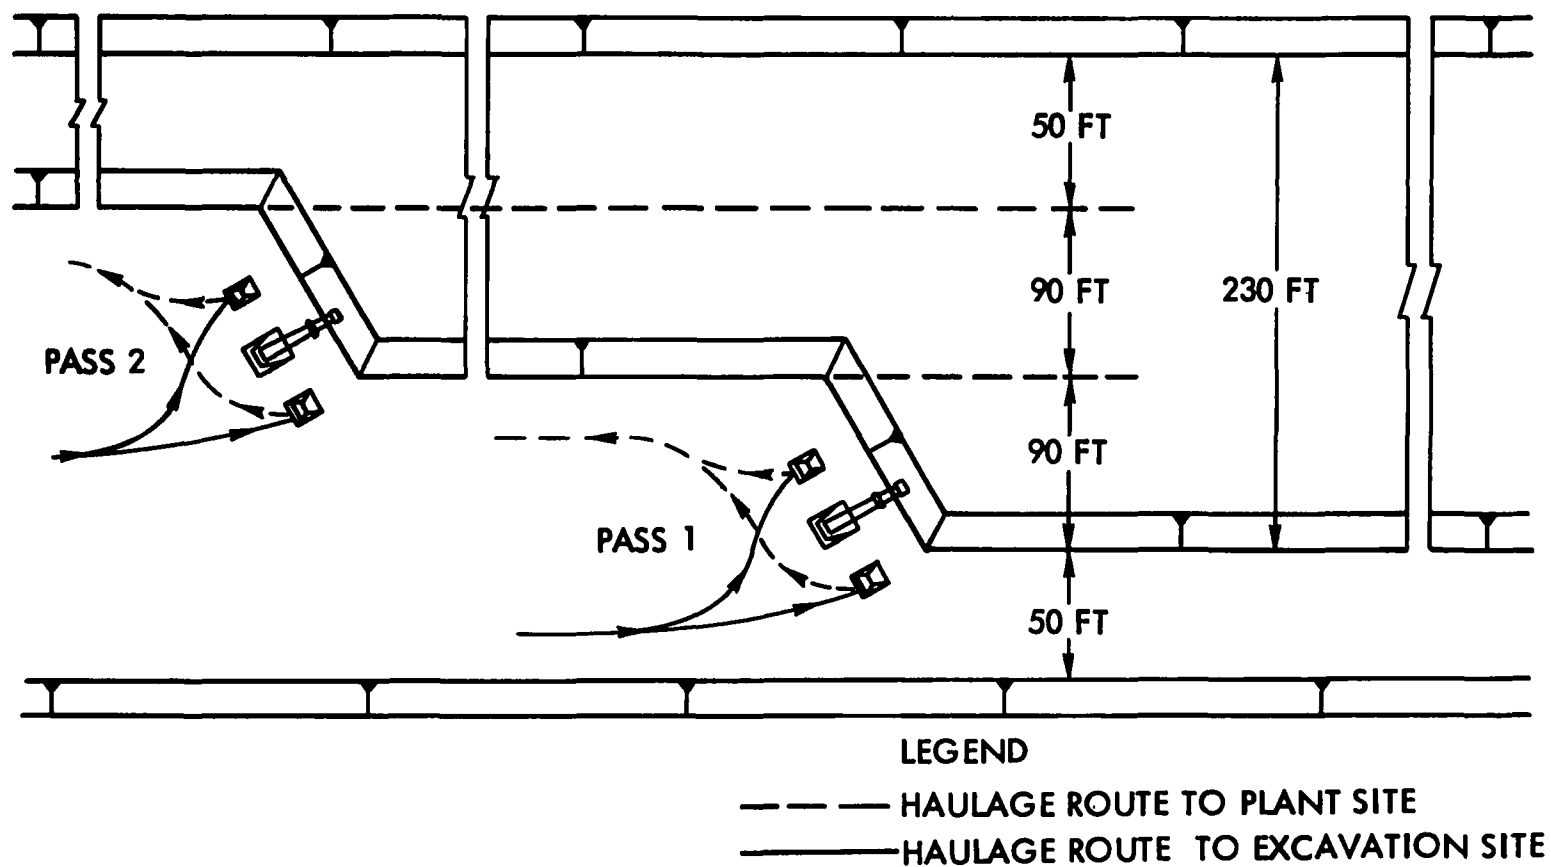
Typical Bench Development Viewed from Above - Tract C-a (7)
